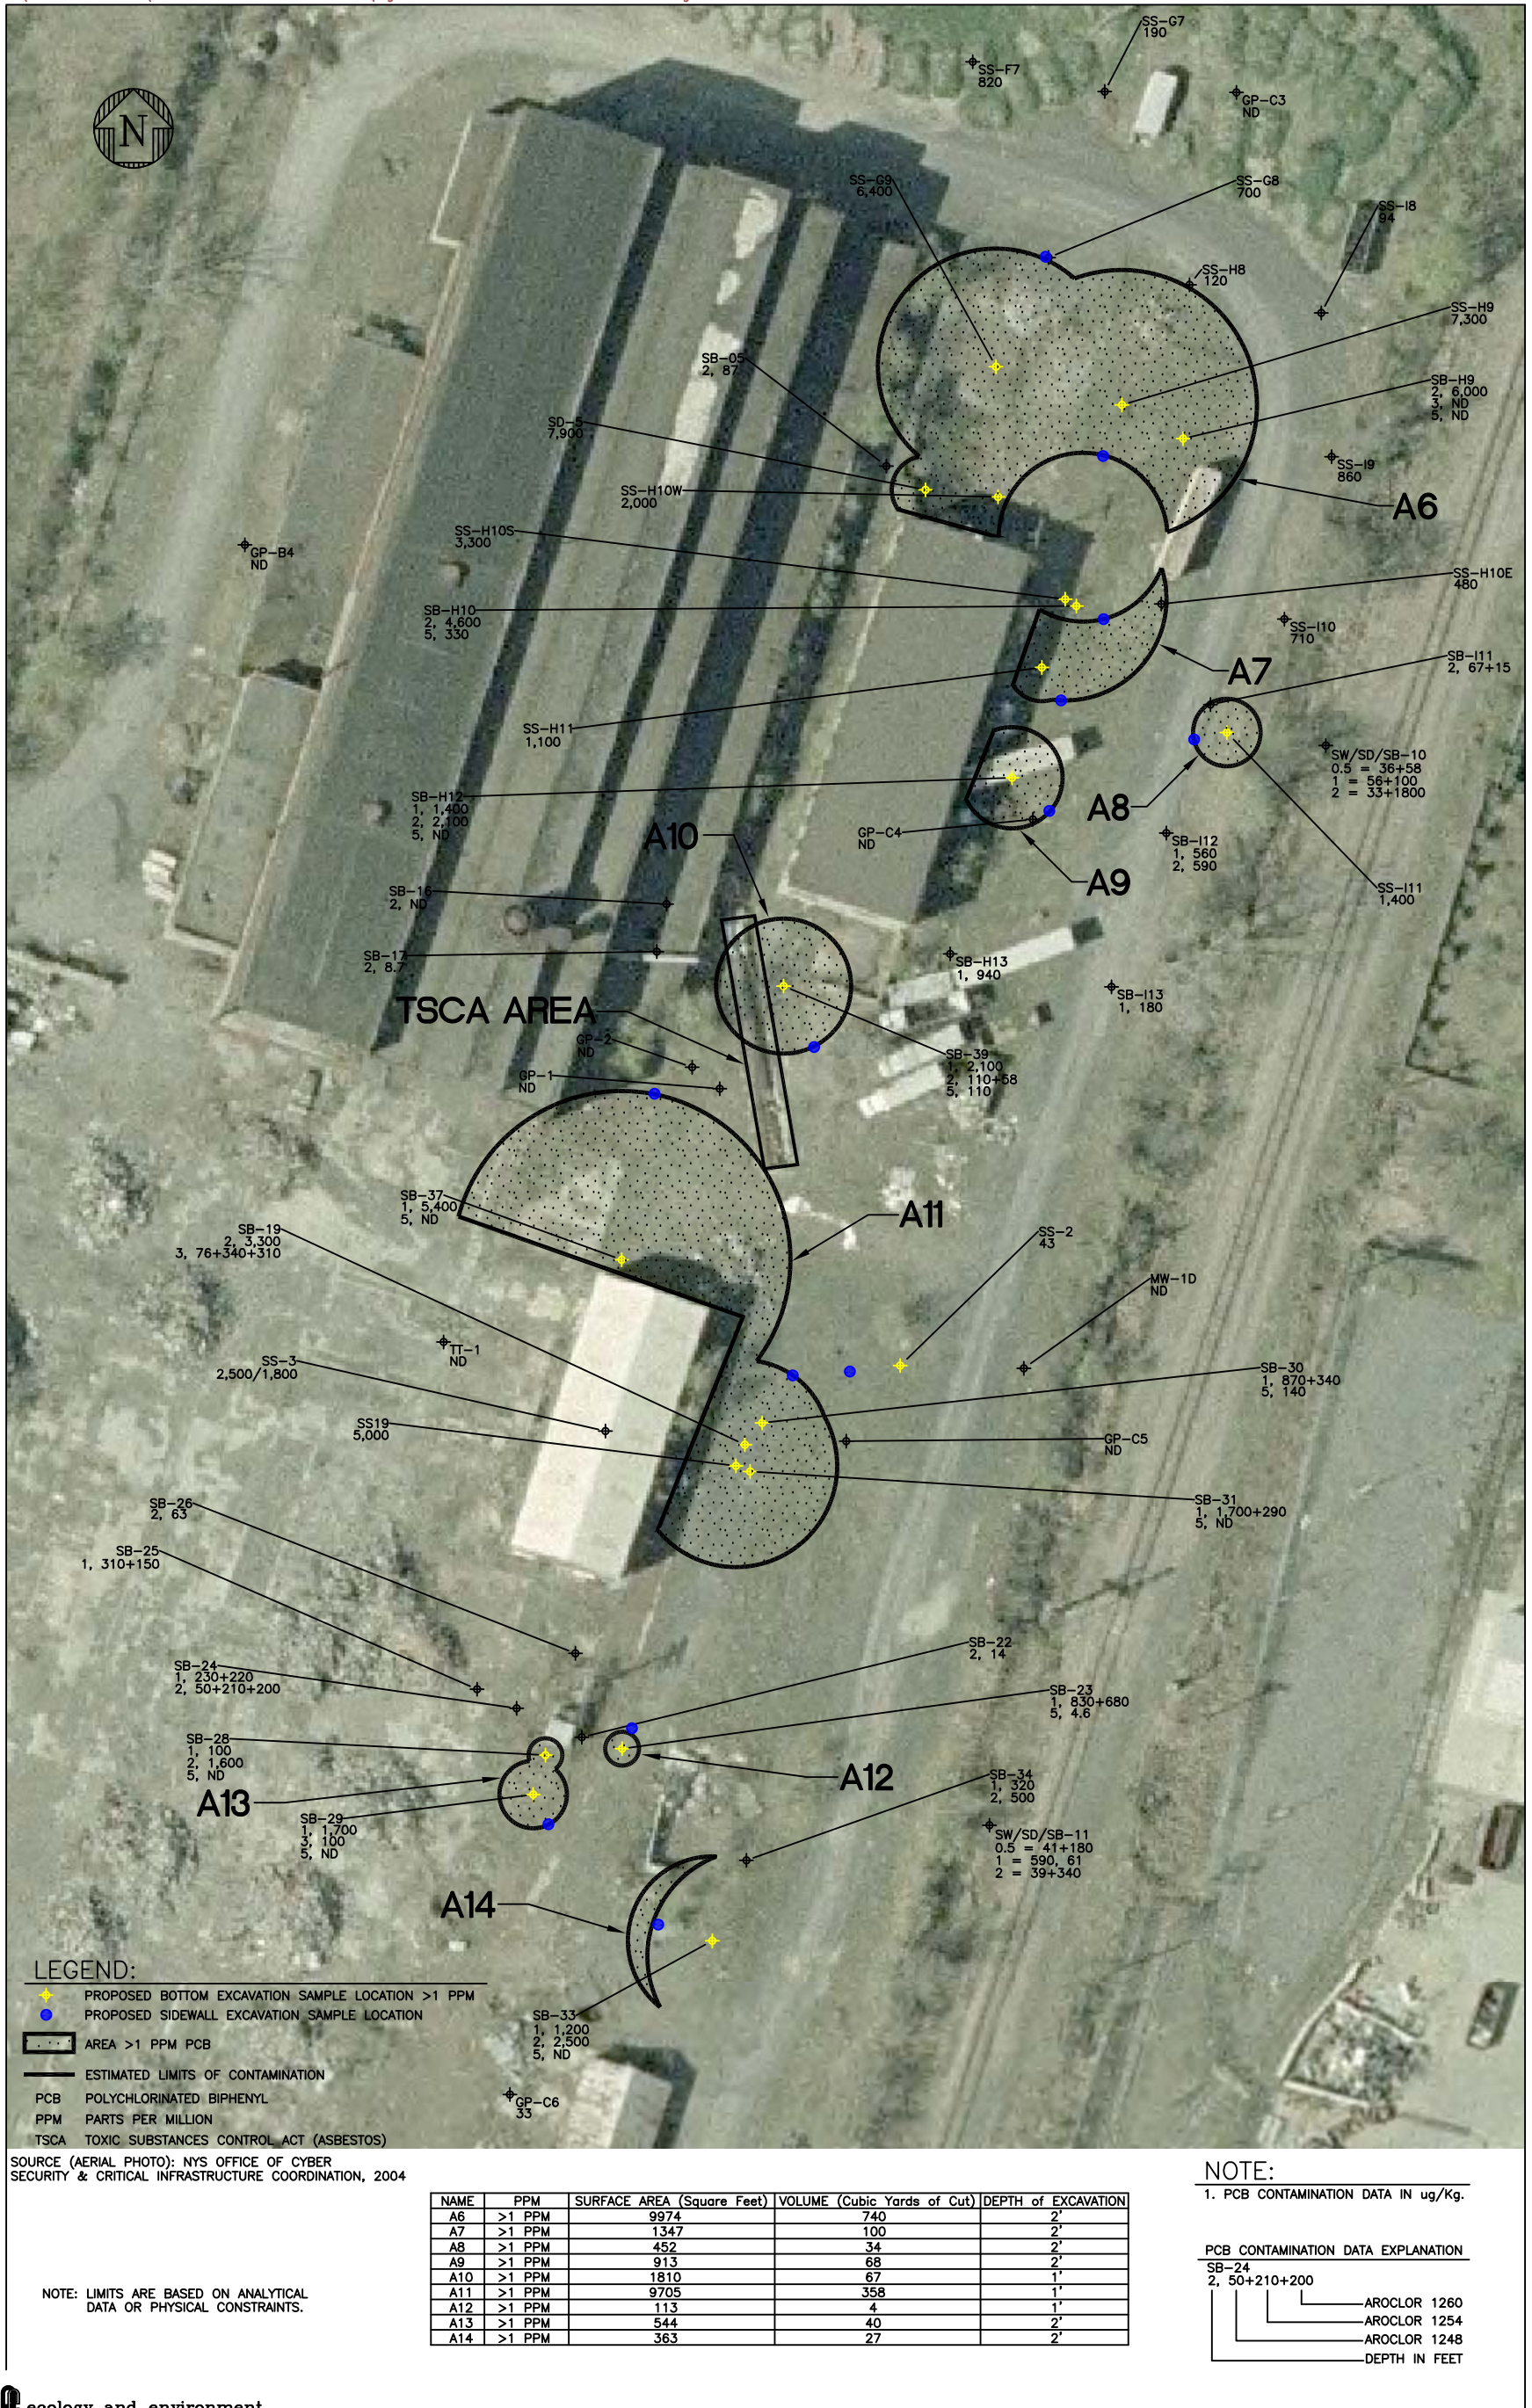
FORMER ADIRONDACK STEEL SITE
